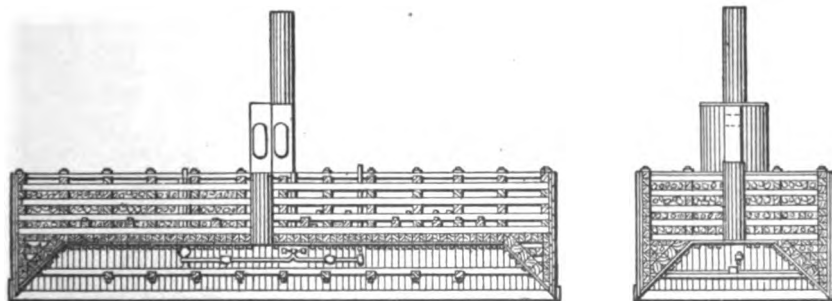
PNEUMATIC CAISSON FOR FOUNDATION OF A BRIDGE PIER.
